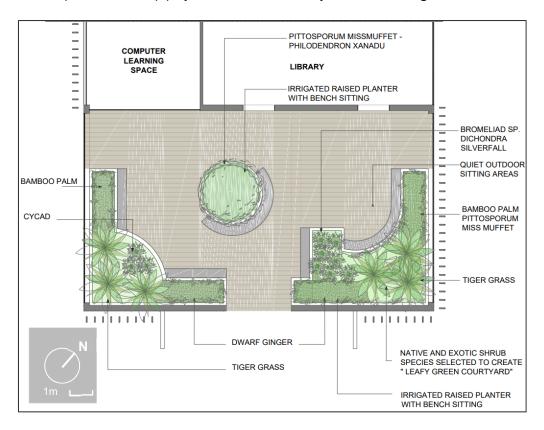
| Library rooftop play court (source: Applicant's EIS 2019)
